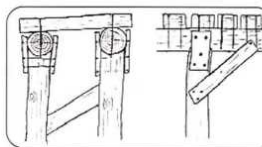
BRIDGE STRINGER SUPPORT AND CROSS BRACING
